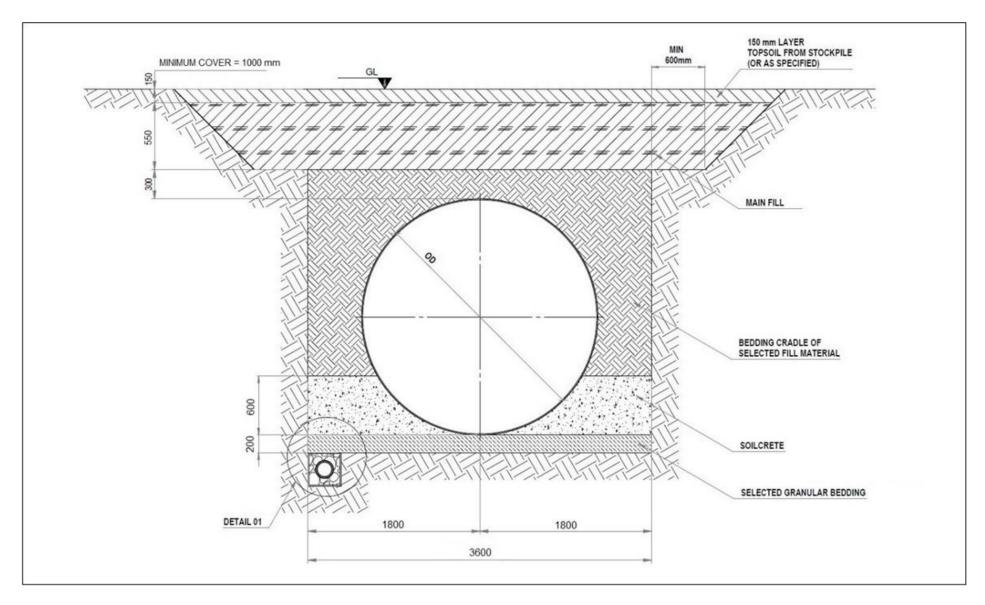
Typical cross section of Syphon 1 – underground portion of pipe installation
